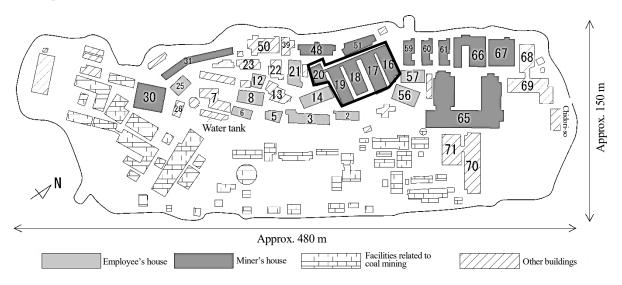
Buildings No.16 to 20 layout drawing
